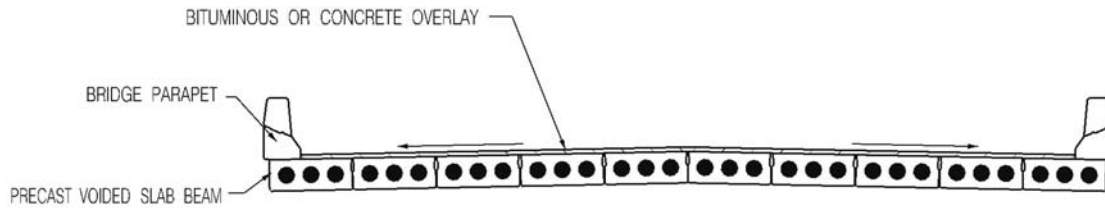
NORMAL CROSS SLOPE SECTION WITH CANTED BEAMS
